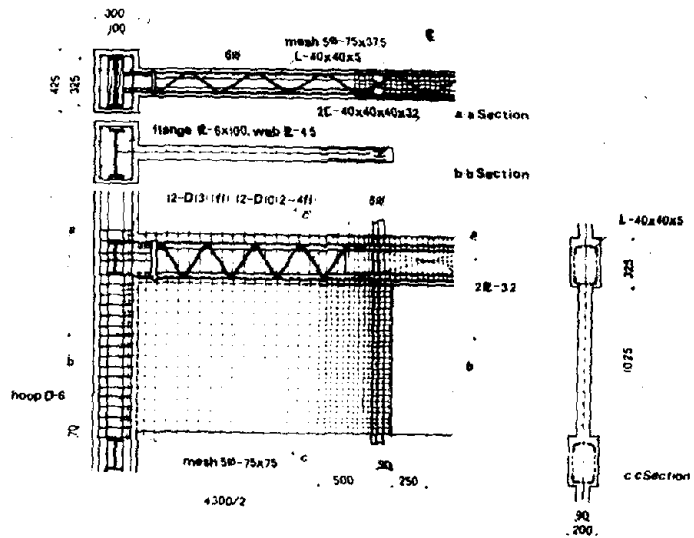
REINFORCEMENT: SHEAR WALL WITH OPENING
